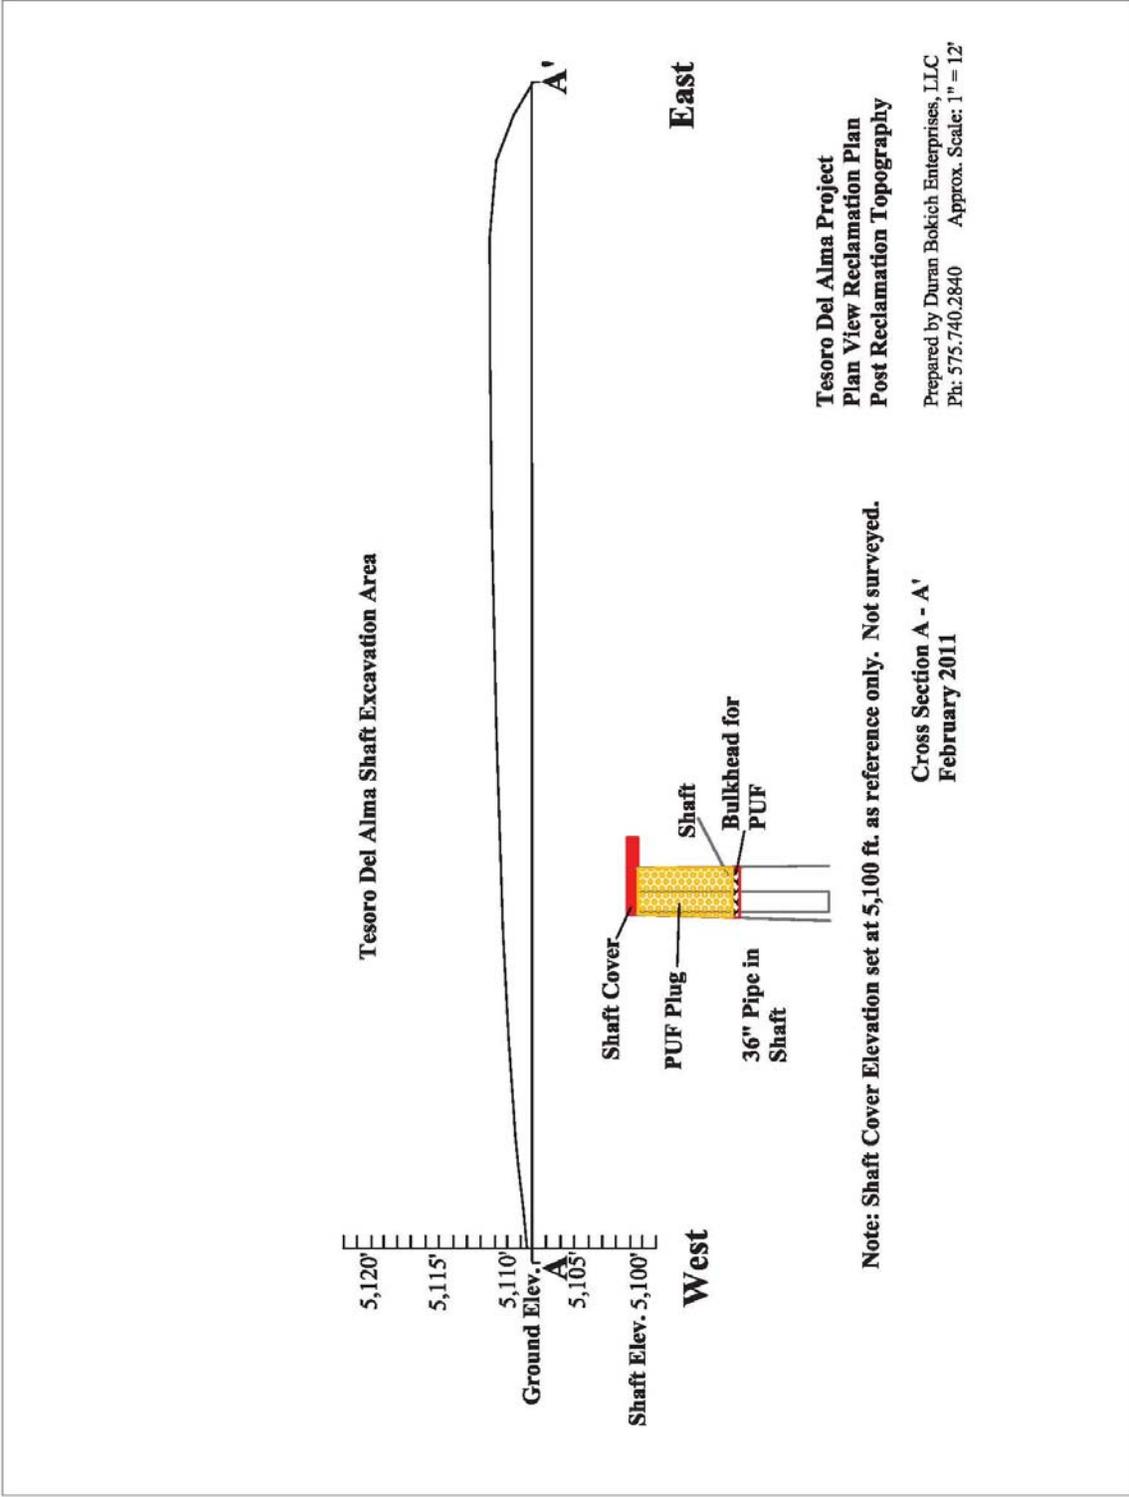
Appendix A. Shaft cover, PUF plug, Shaft, Bulkhead for PUF, 36" pipe in shaft.
